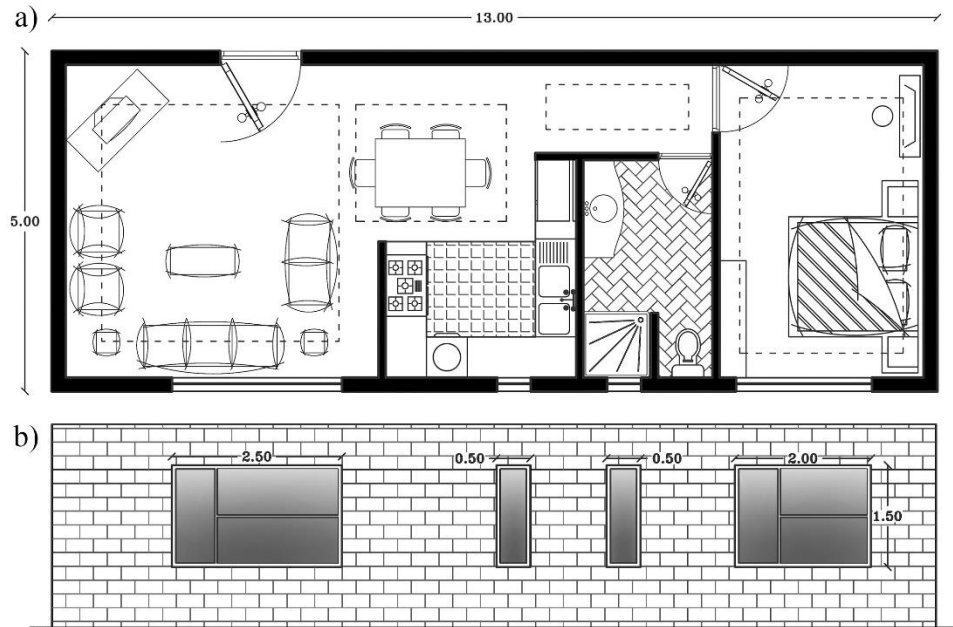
Model used for simulations; a) Plan; b) South elevation
